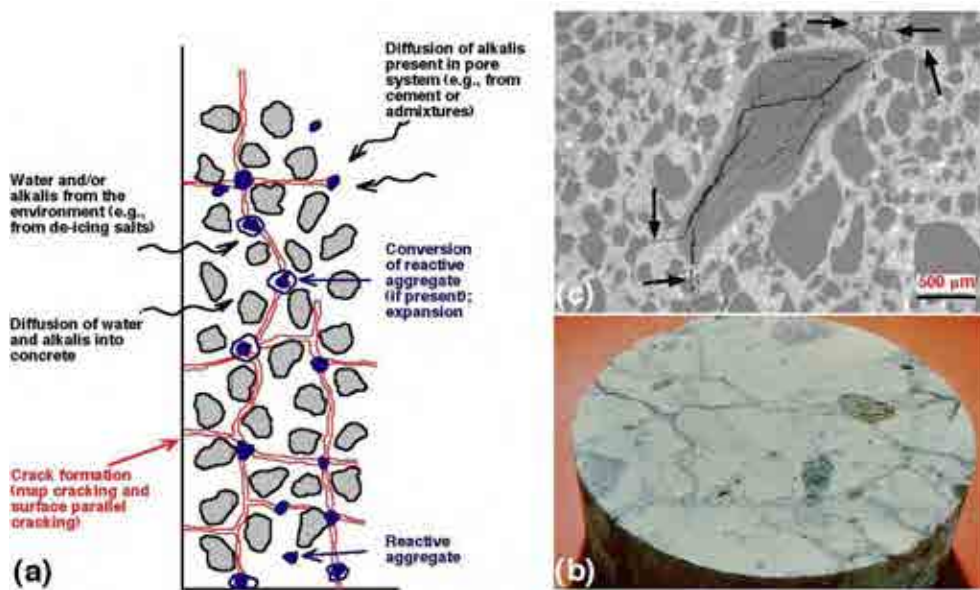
Concrete cracking due to ASR: (a) mechanism [87]; (b) resulting gel that causes expansion and cracking [98]; (c) polished section of concrete showing chert particle with extensive internal cracks extending from aggregate as noted by arrows [136].
